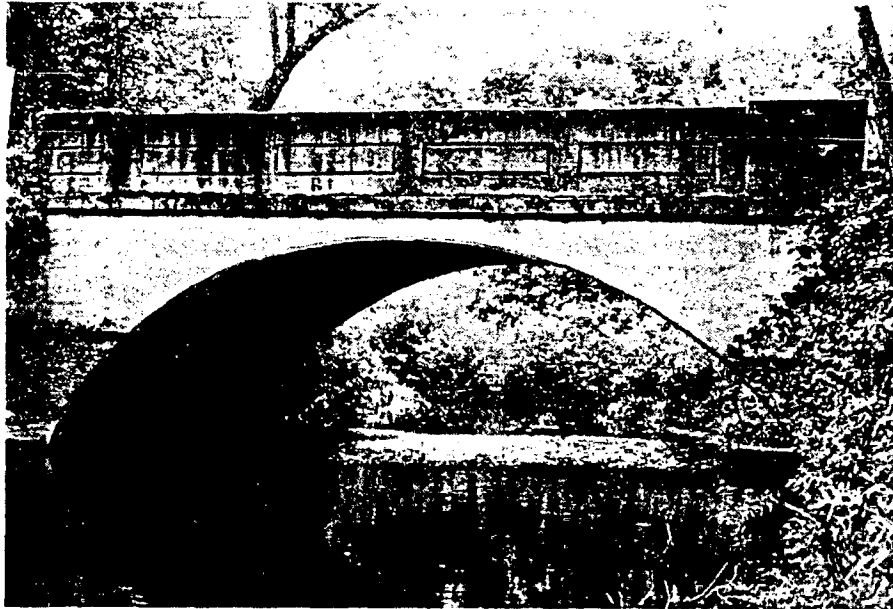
Typical single-span Luten barrel arch highway bridge. This type, patented by Daniel B. Luten, was built throughout Virginia.
